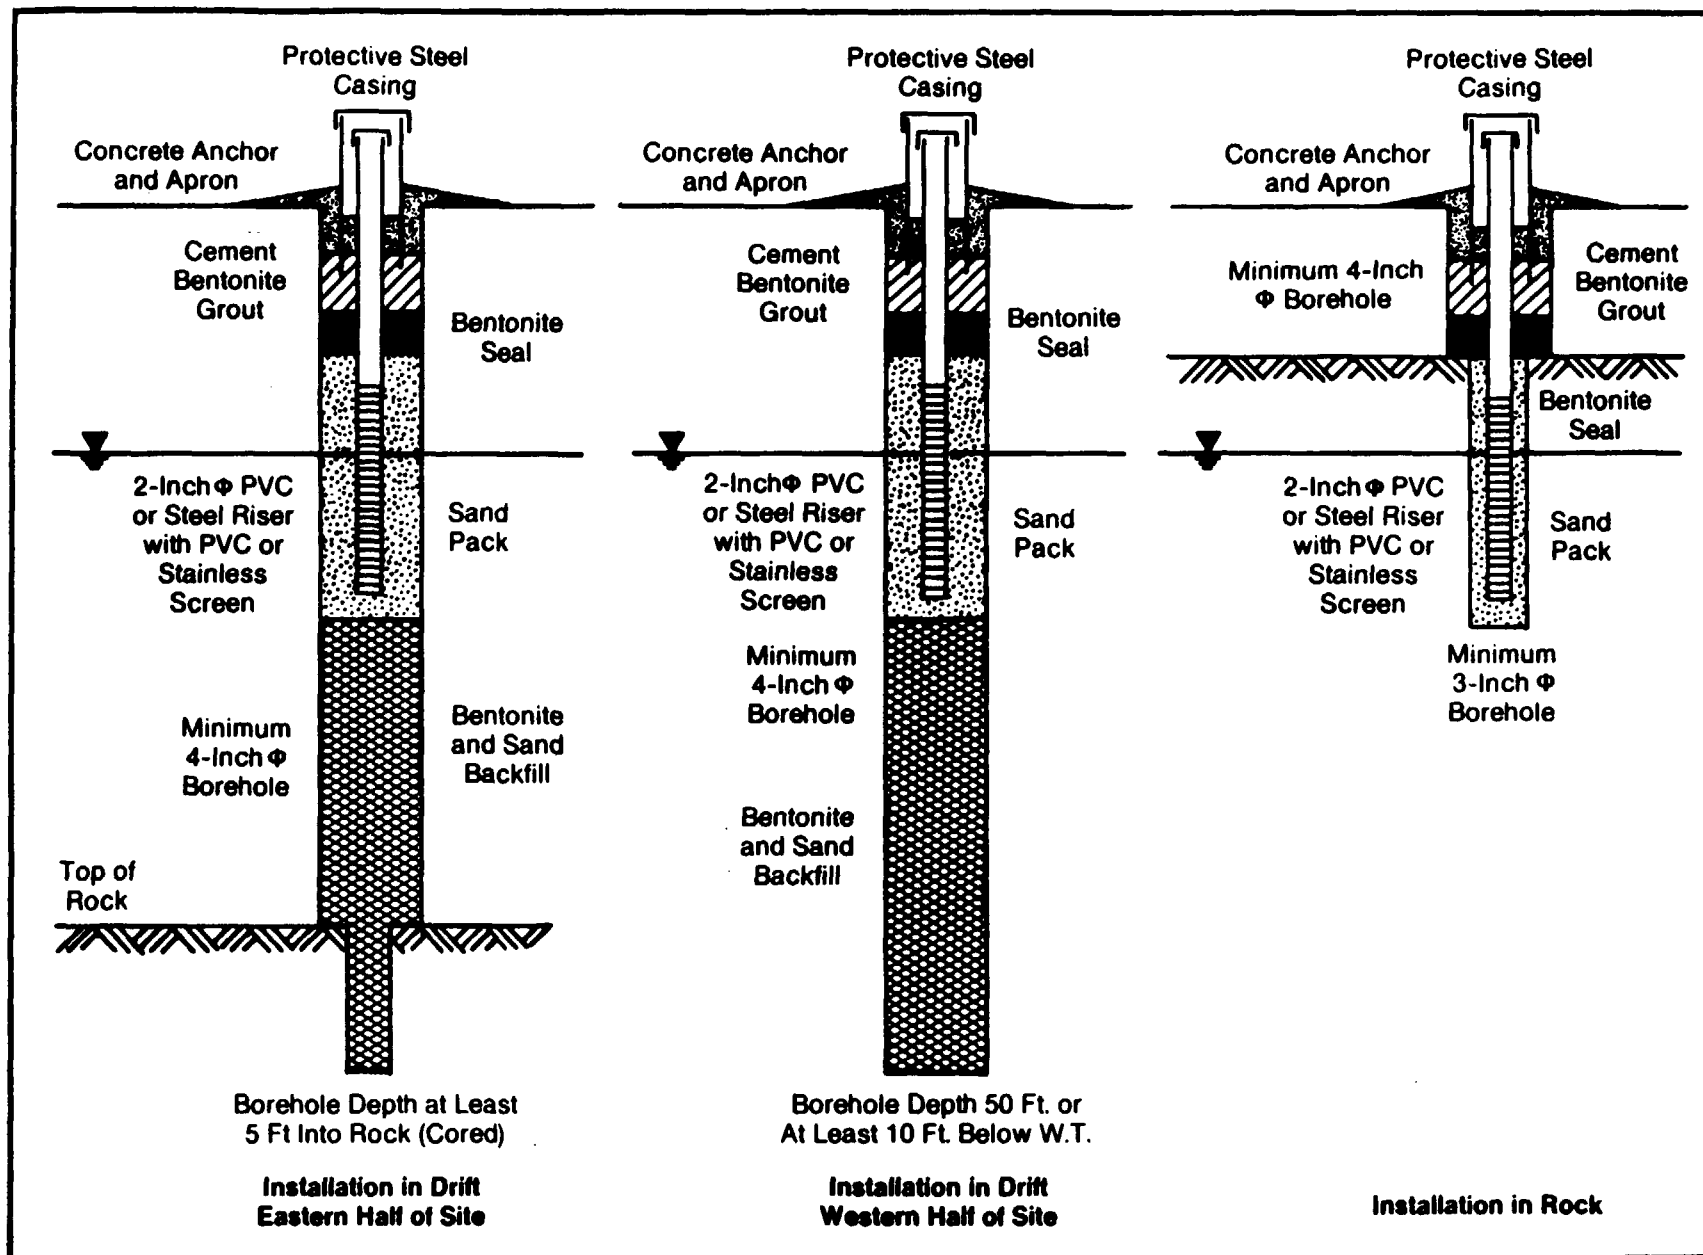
CONSTRUCTION DETAILS - SINGLE WELL INSTALLATION
